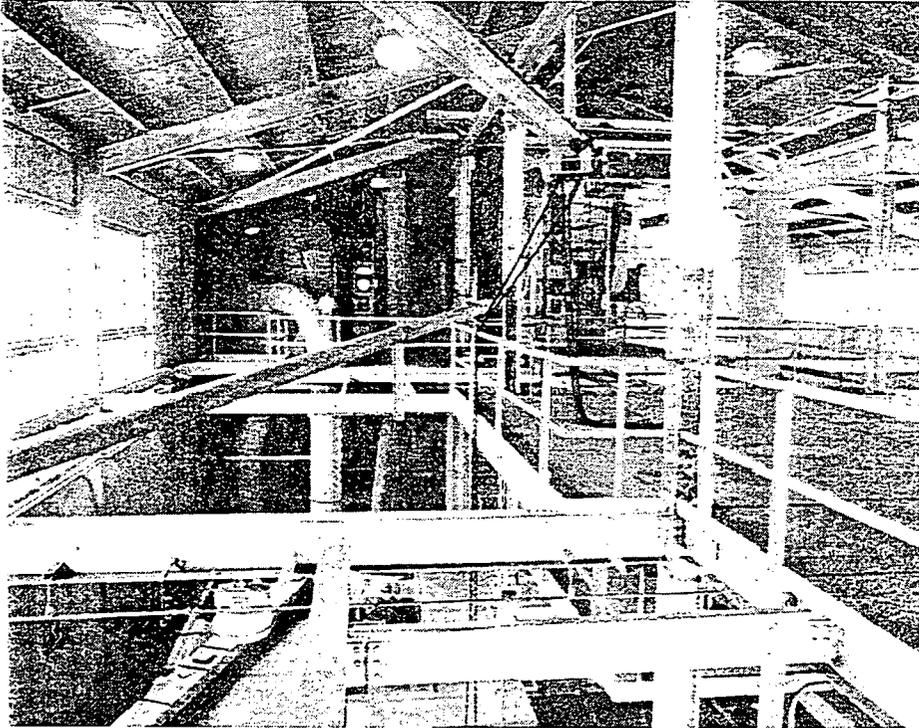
Building 1A - Facing West, Fourth Floor
